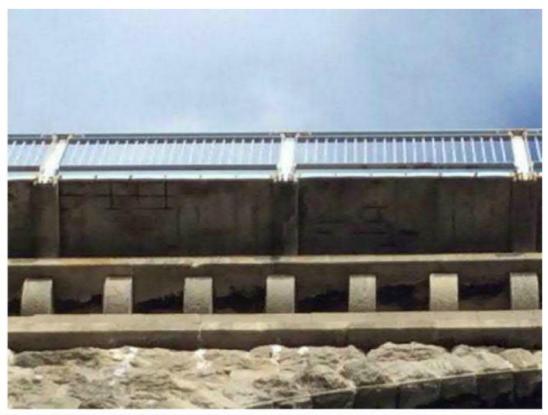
Parapet beam or cantilever - wide areas of spalling and exposed rebar to soffit of cantilevered footway to the west of spans 1-4
